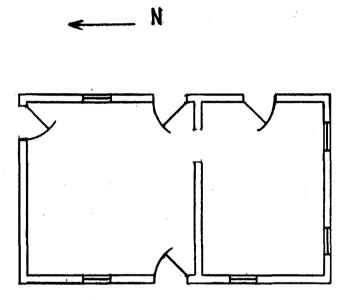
FLOOR PLAN OF THE ORIGINAL HOUSE
